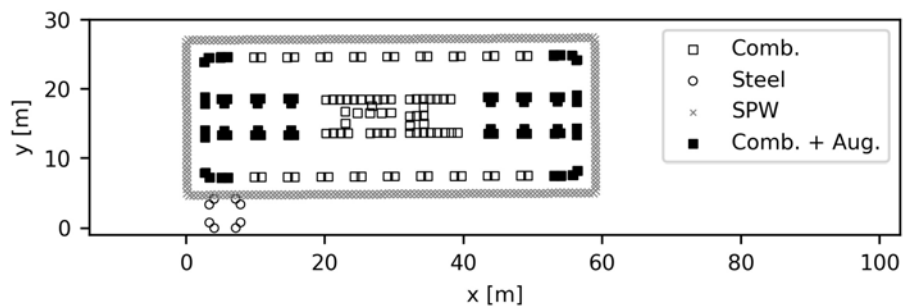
Deep foundation plan for Habitat 7 includes combination (concrete and timber) piles (Comb.), open-ended cylindrical steel piles (Steel), and sheet pile walls (SPW). The locations where auger screws were used before installation of the combination piles are also shown (Comb. + Aug.).
